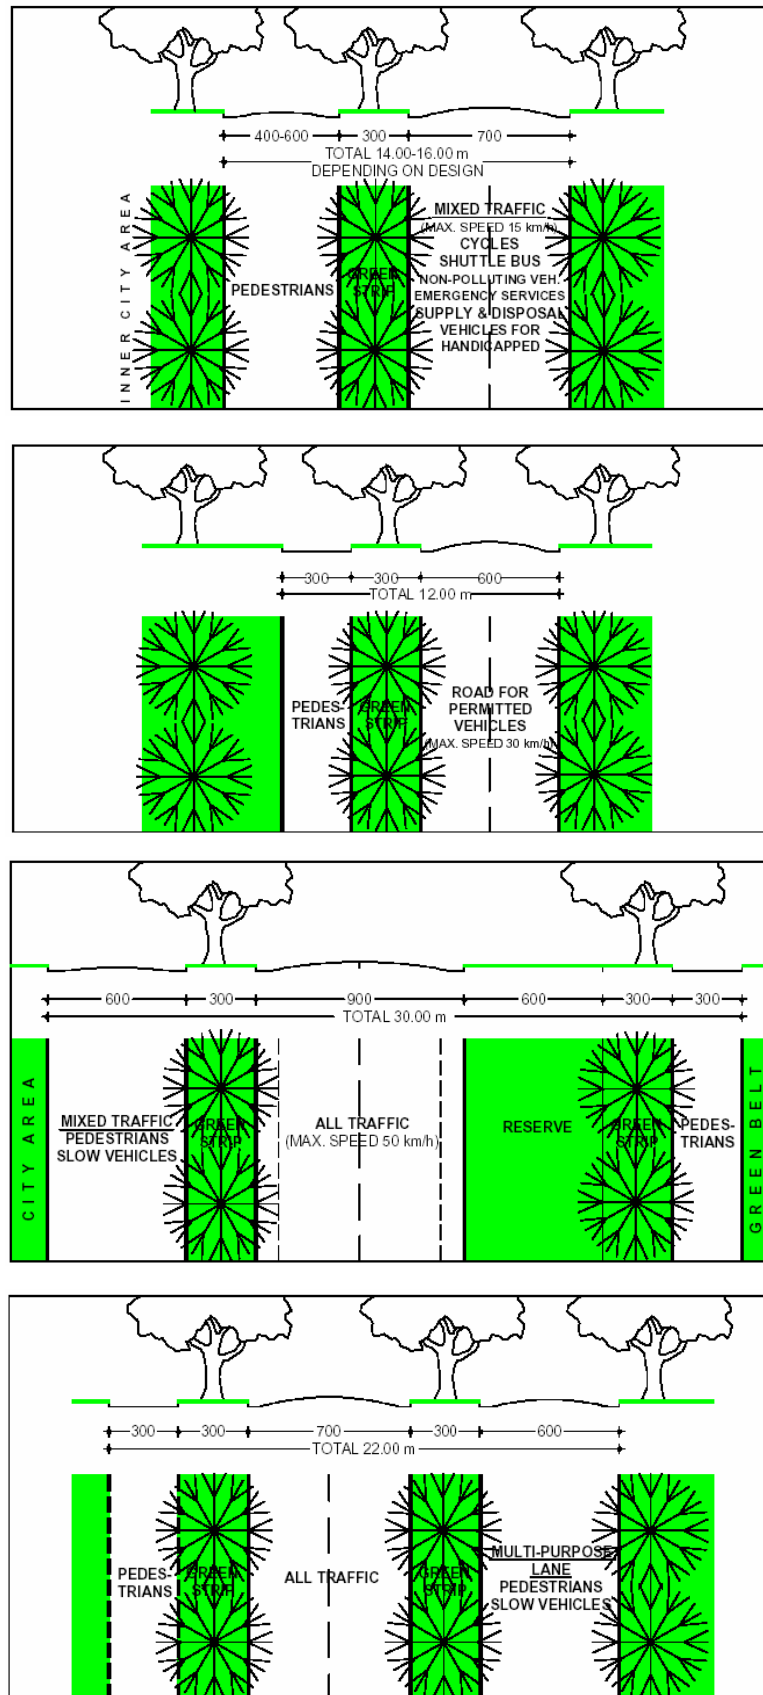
Section of Roads (Source: Auroville Mobility Concept)
